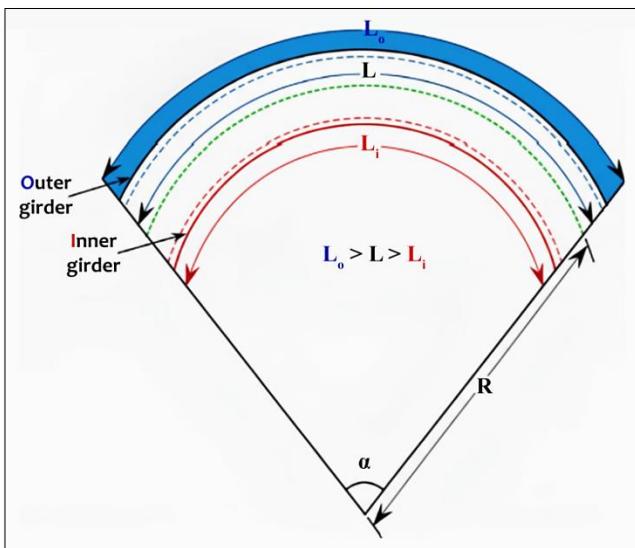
Curved box-girder bridge deck (Agarwal et al., 2023) [3]
